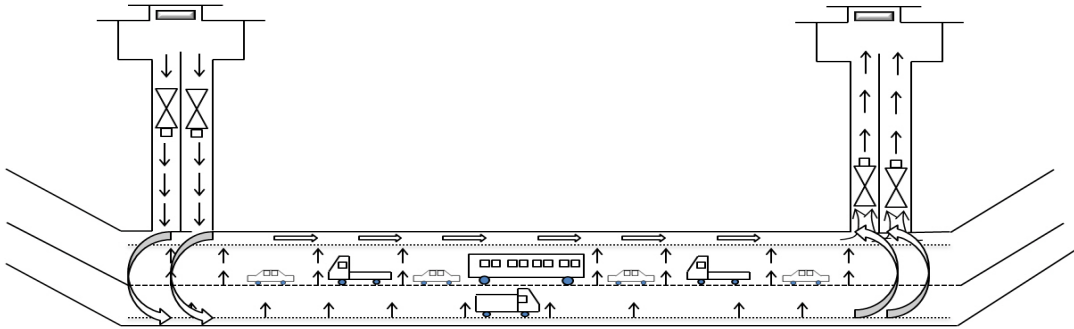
Spain Madrid M30 Tunnel Ventilation System
